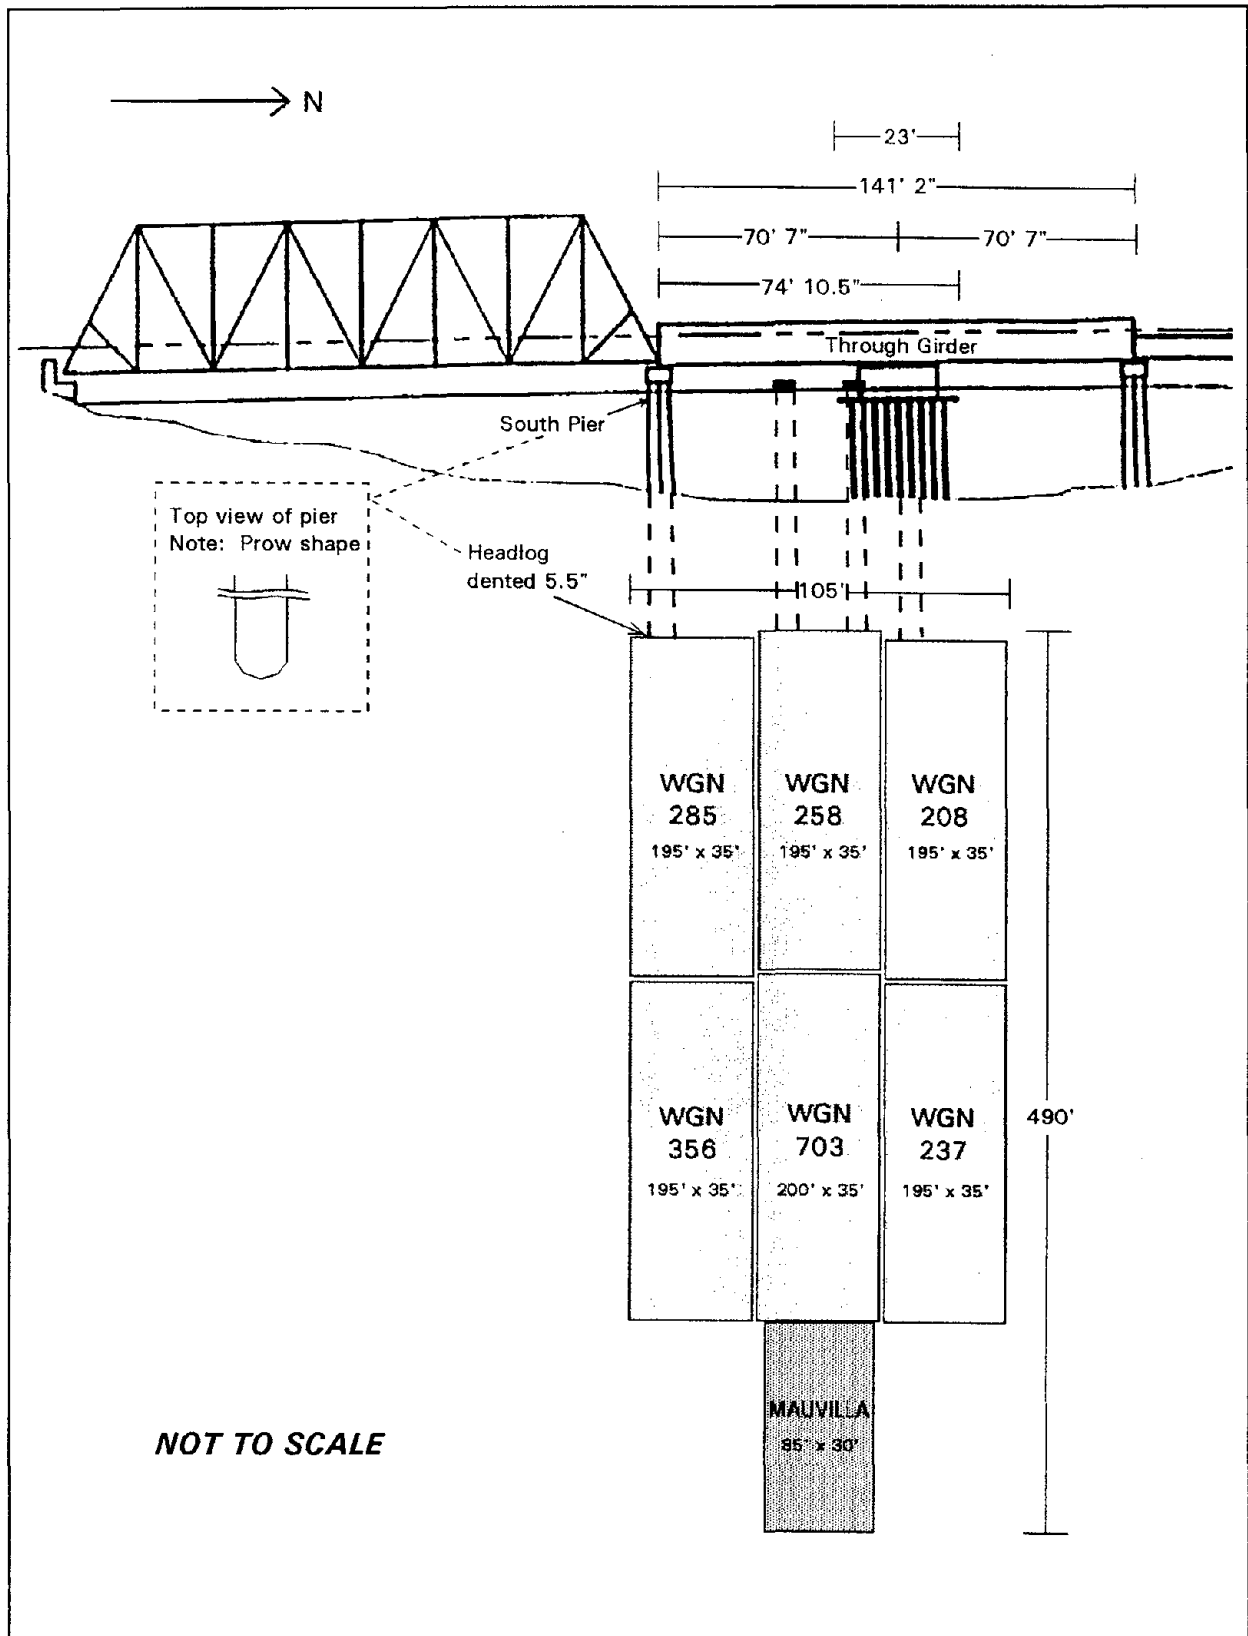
MAUVILLA tow configuration and Big Bayou Canot bridge.
